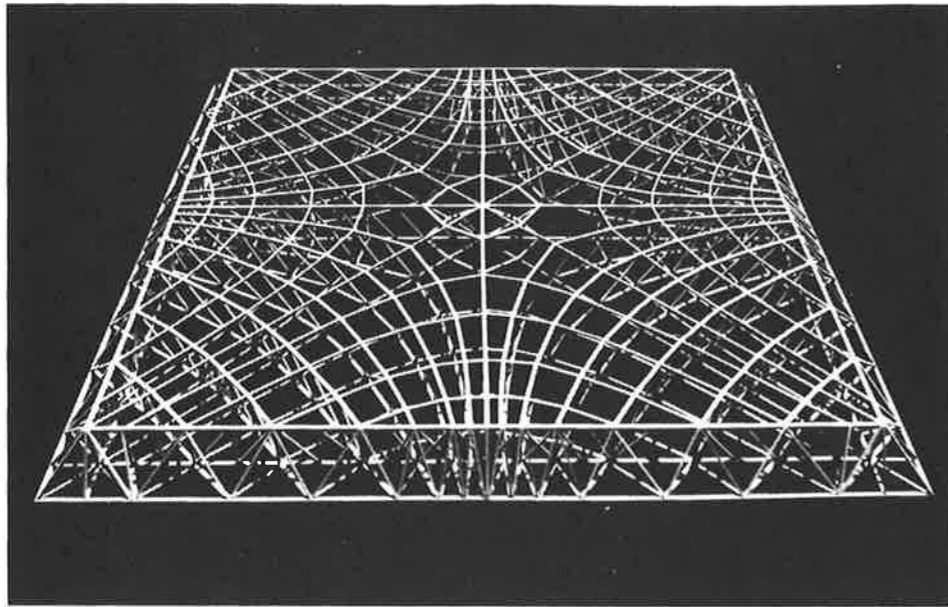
Model of roof structure in Hong-Kong indoor stadium.
